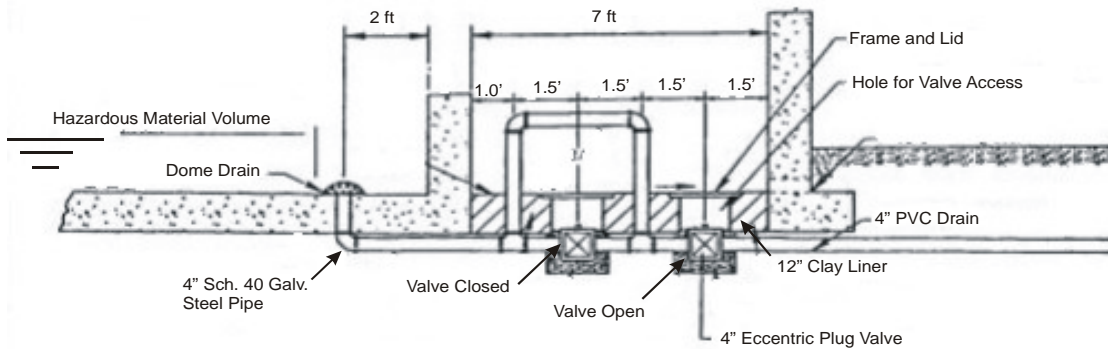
Typical TxDOT Automatic Siphon Detail
